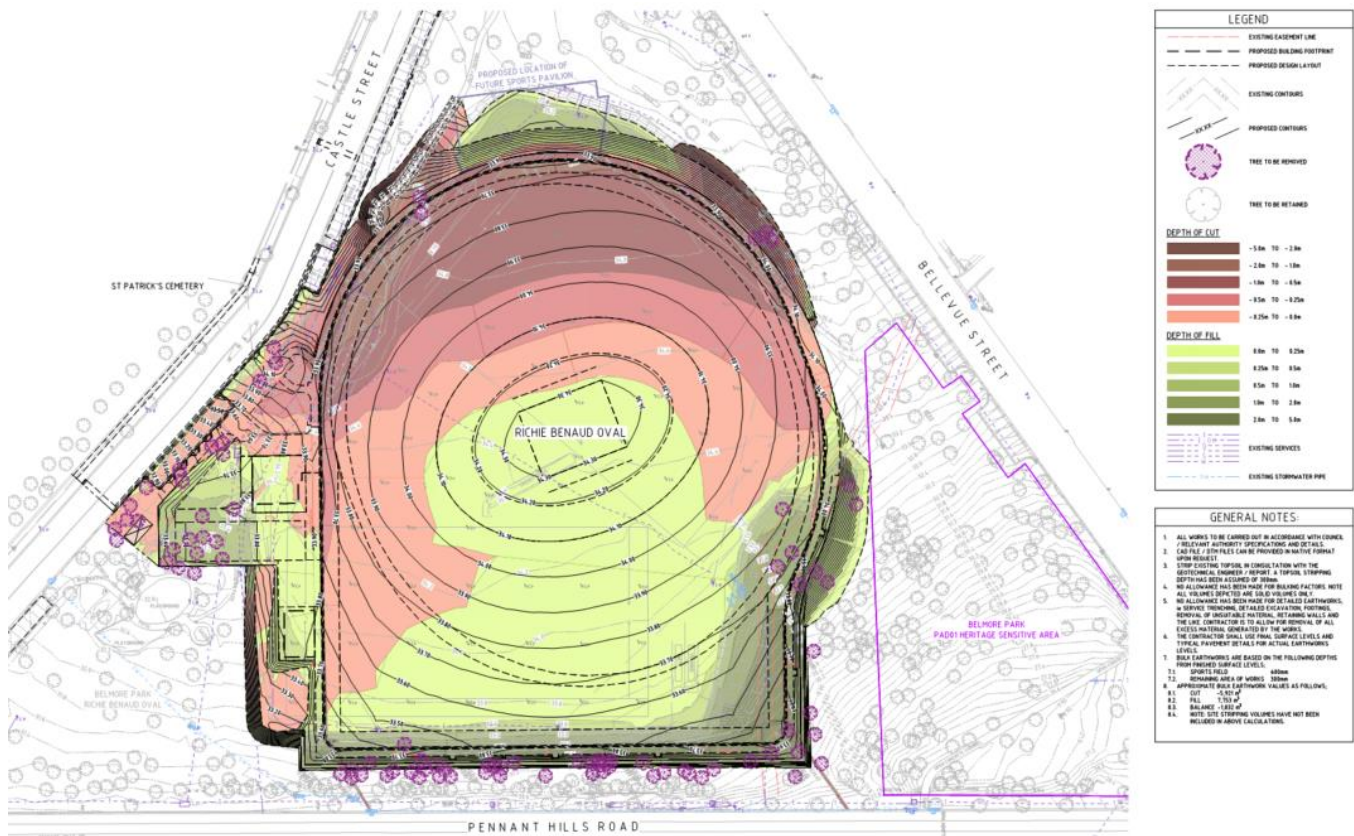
Extract from Cut and Fill Earthworks Plan (Northrop, 2025)
